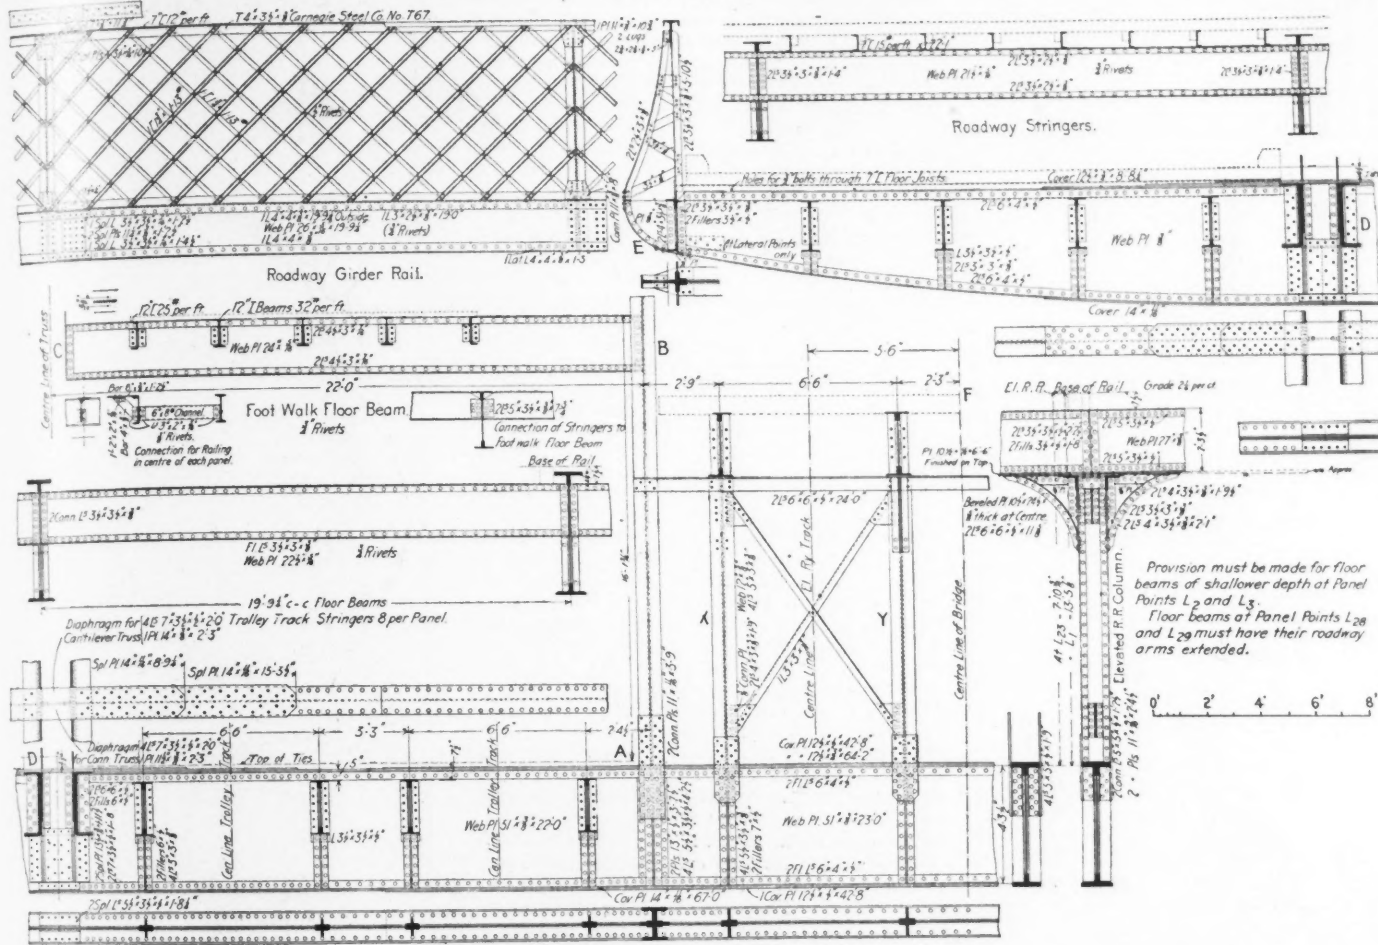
DETAILS OF FLOOR CONSTRUCTION IN END SPANS.
